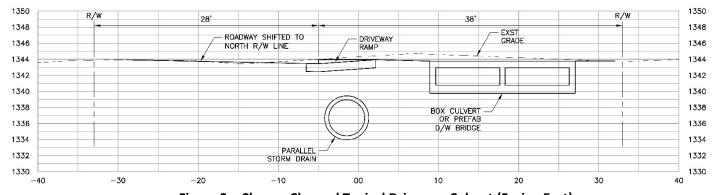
Cheney Channel Typical Driveway Culvert (Facing East)
